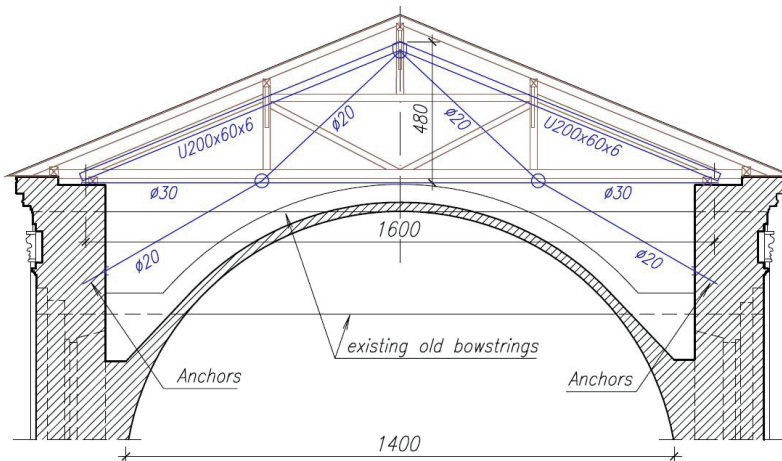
Triangular tension-strut sets to be placed on both sides of each roof truss.
